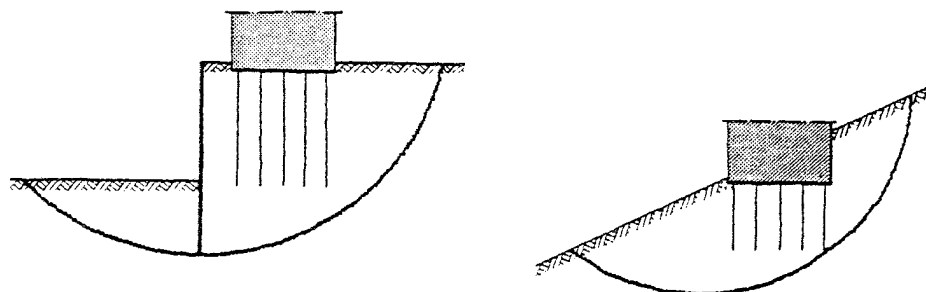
a. Examples of Loss of Overall Stability for a Piled Foundation
